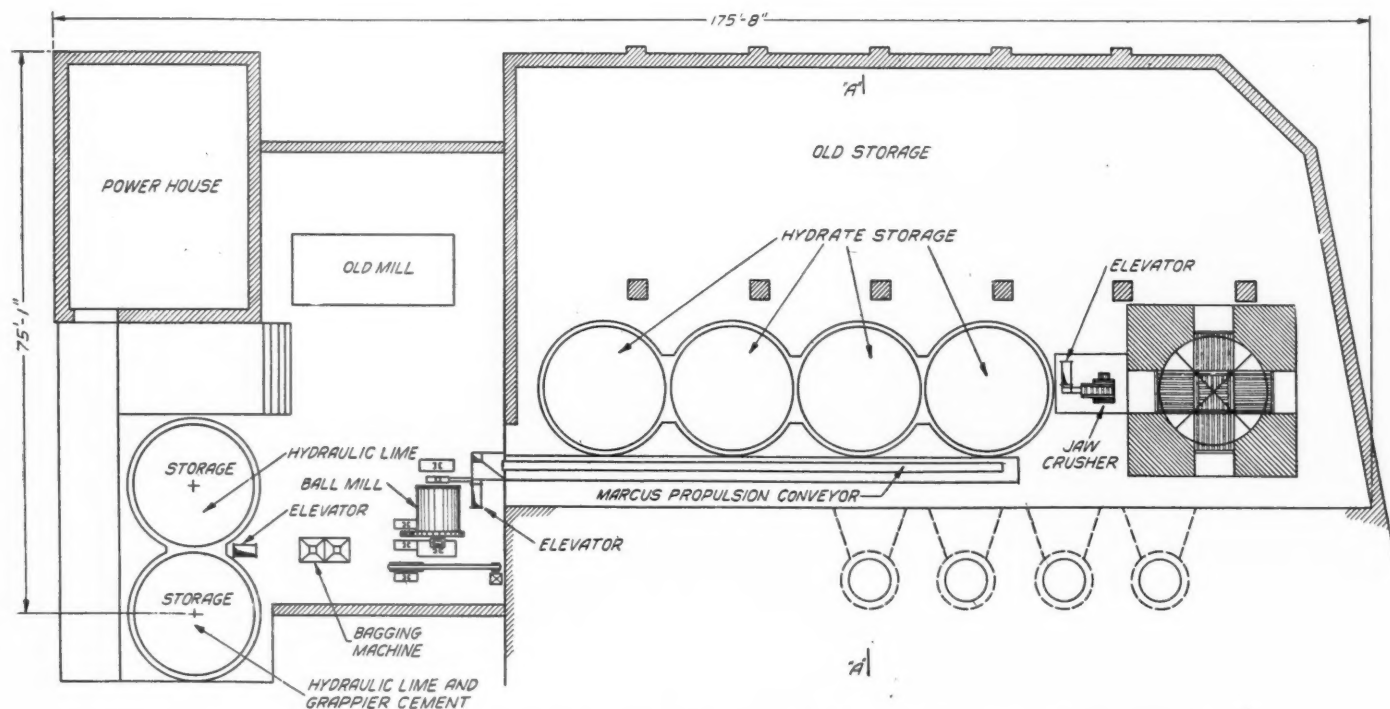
A diagram which shows in plan the hydrating machinery with storage silos and conveyors drawn to the same scale as the elevation above
